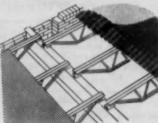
#### DETAILS FOR OPEN WEB STEEL JOIST CONSTRUCTION
